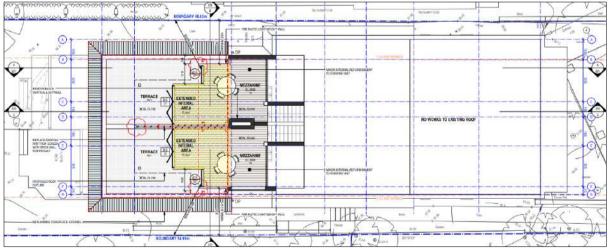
Extract of Second Floor of Units 3 and 4 showing area of proposed works
